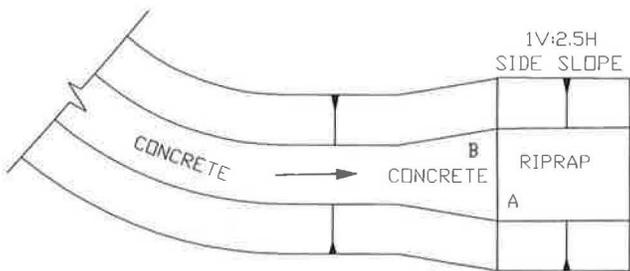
Plan view of channel in Example 4: (a) riprap failure, (b) sediment deposition.
